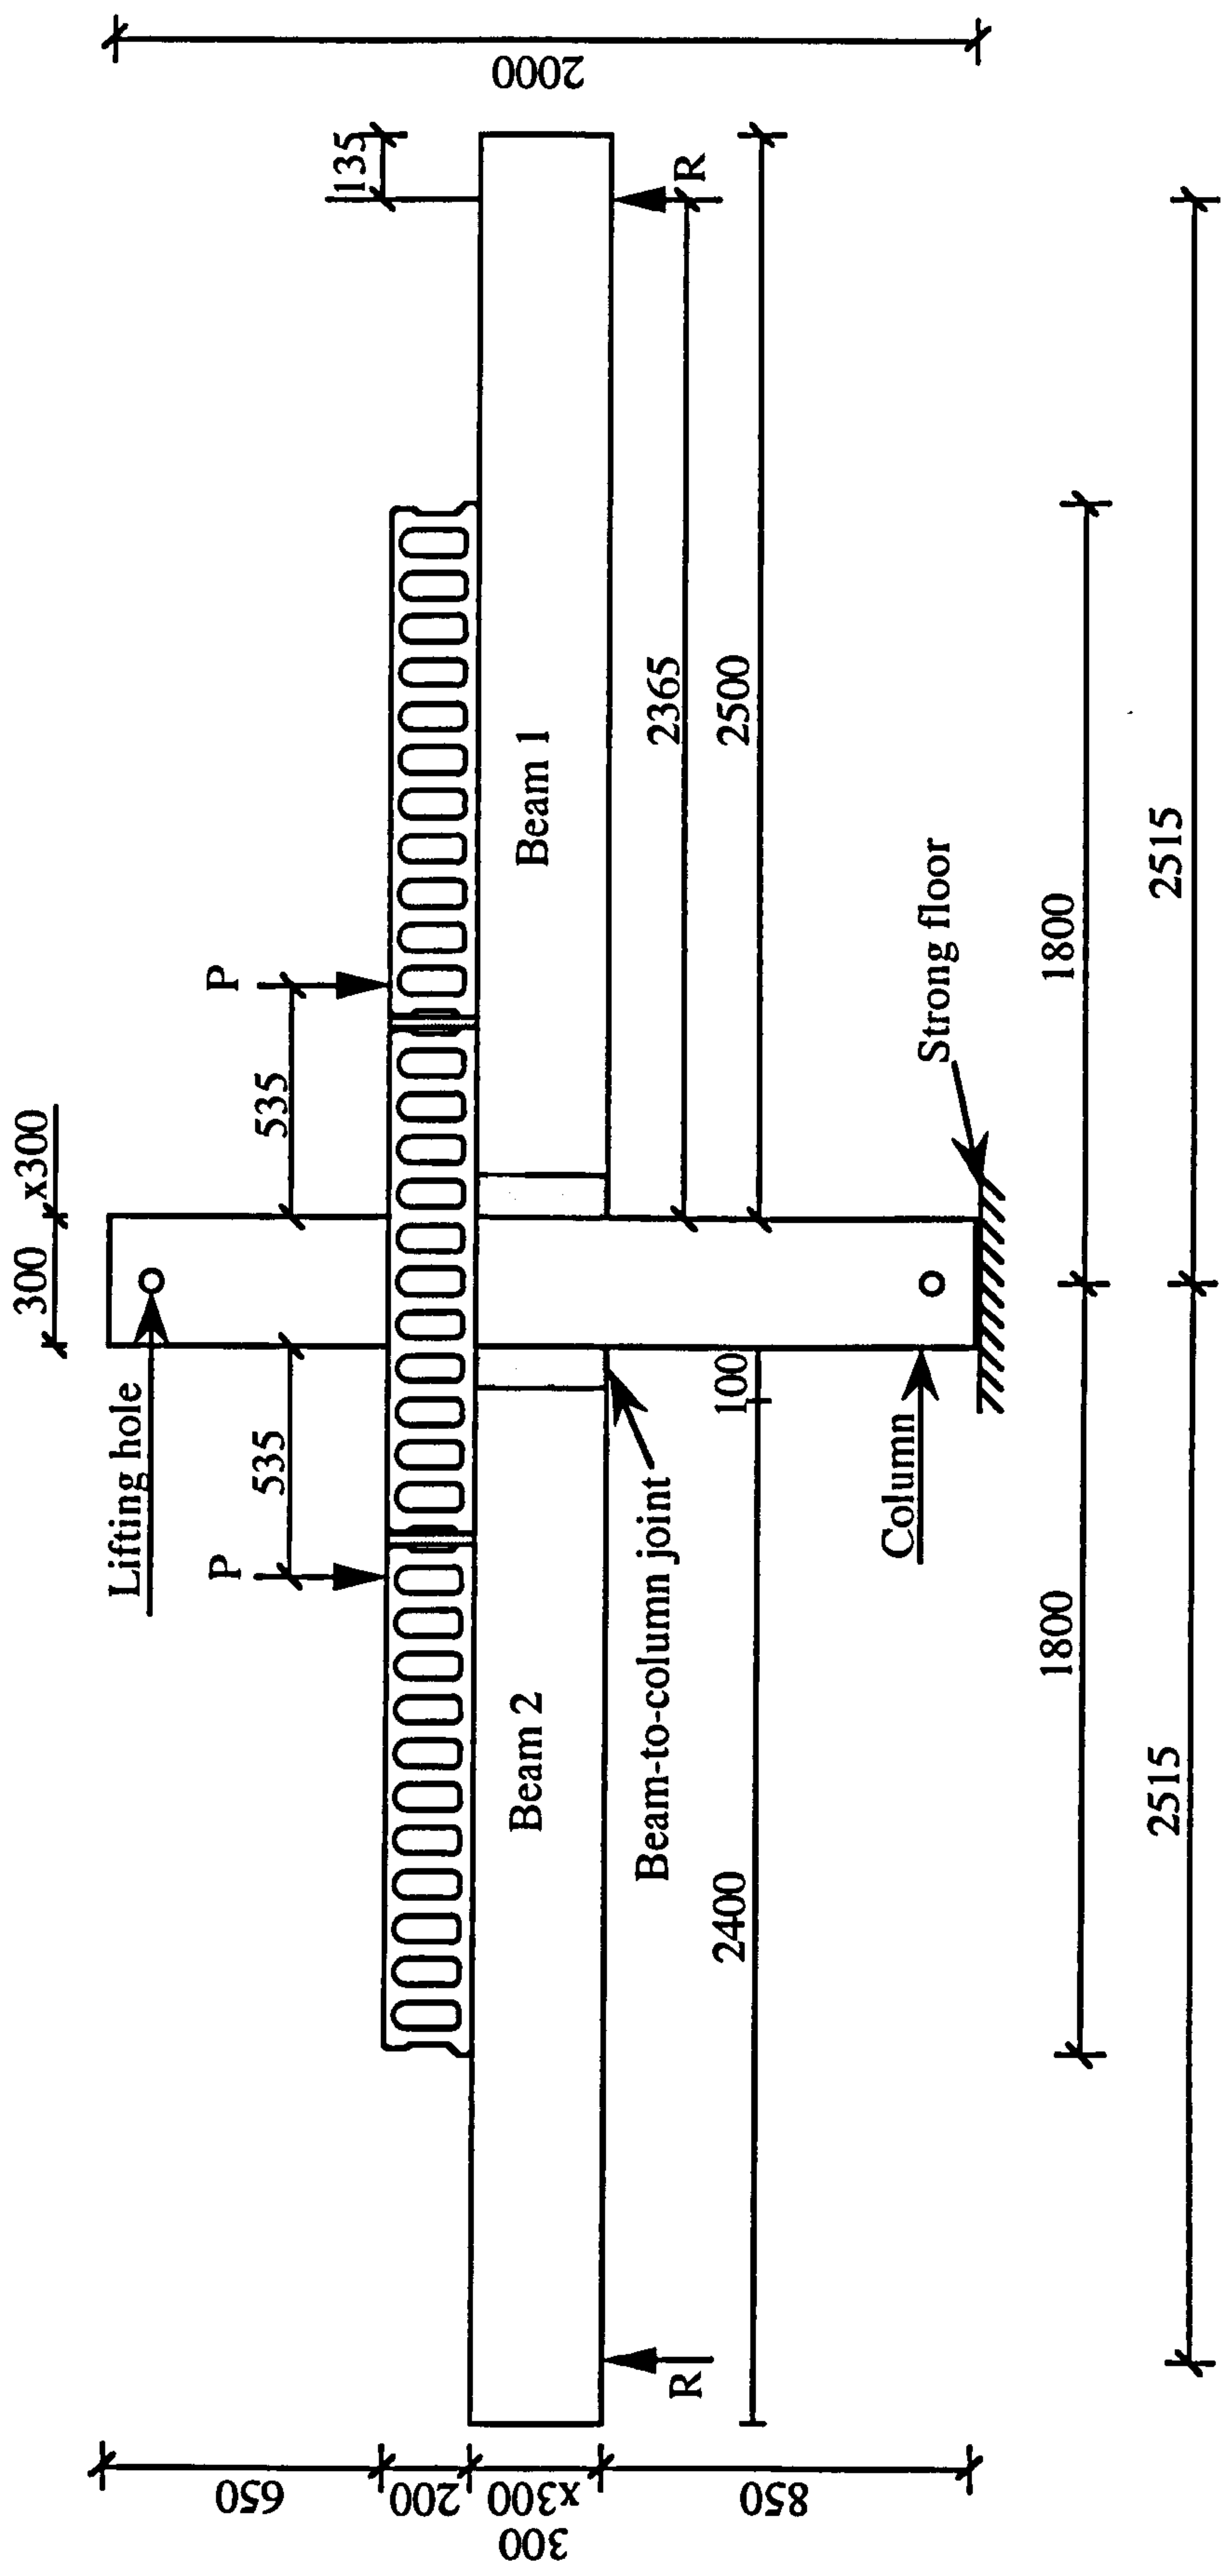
Front elevation of subframe SF1 with floor slabs for test series 1-TW1(B)
